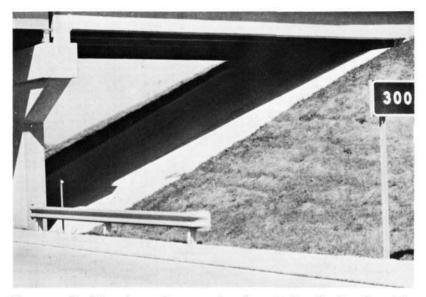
On this project, only one section of guardrail 25 feet long is used in advance of the side piers. This is too short to give any real protection to drivers who run off the roadway.
